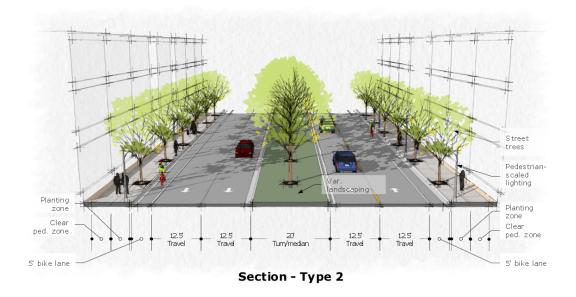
Configuration and dimensional requirements for street section Type 2 areas identified in the Street Section Plan.
